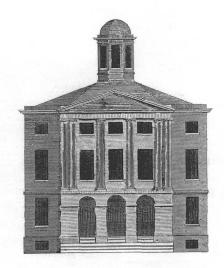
Elevation for a Courthouse, pl. 58, Asher Benjamin, *The American Builder's Companion*, 1827 edition
